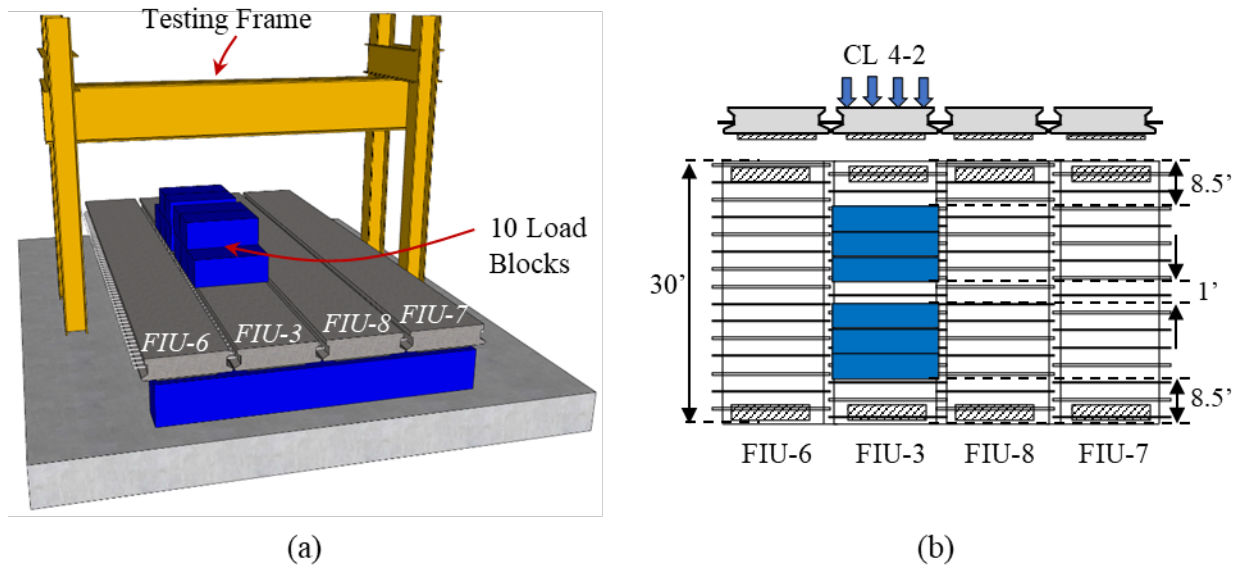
Test setup for Camber Leveling 4-2: (a) schematic and (b) plan and elevation view
